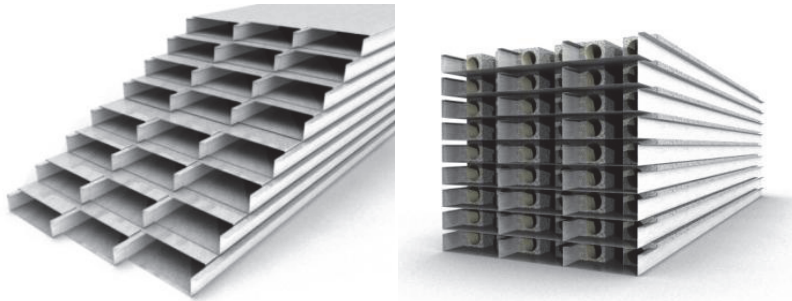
Package of the parts, left: profiled steel sheeting storage, right: prefabricated slab elements storage
